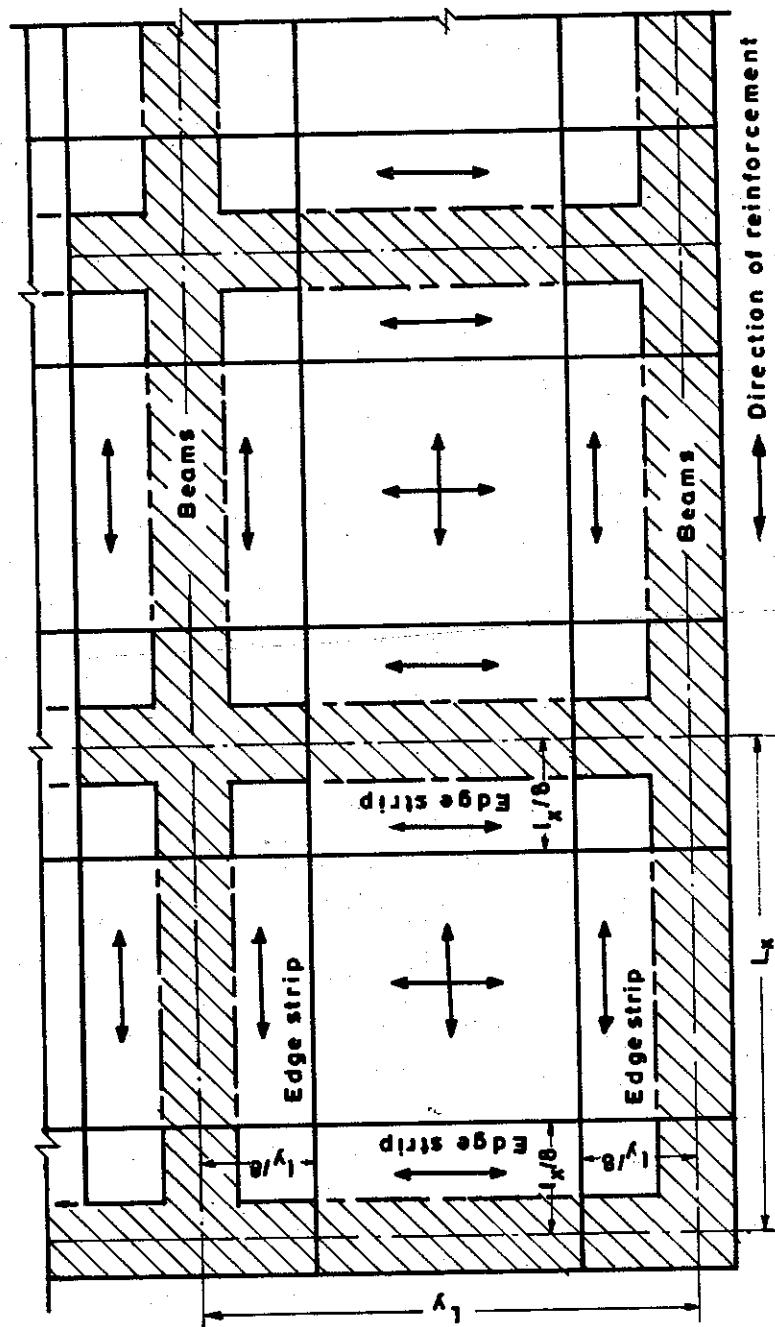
Layout of steel in two-way simply supported slabs.
